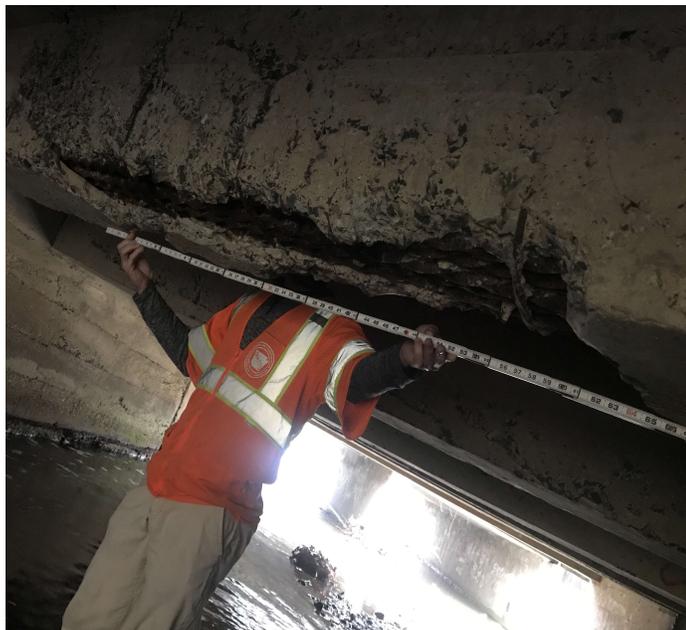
Description Girder 6 spall with exposed rebar.
